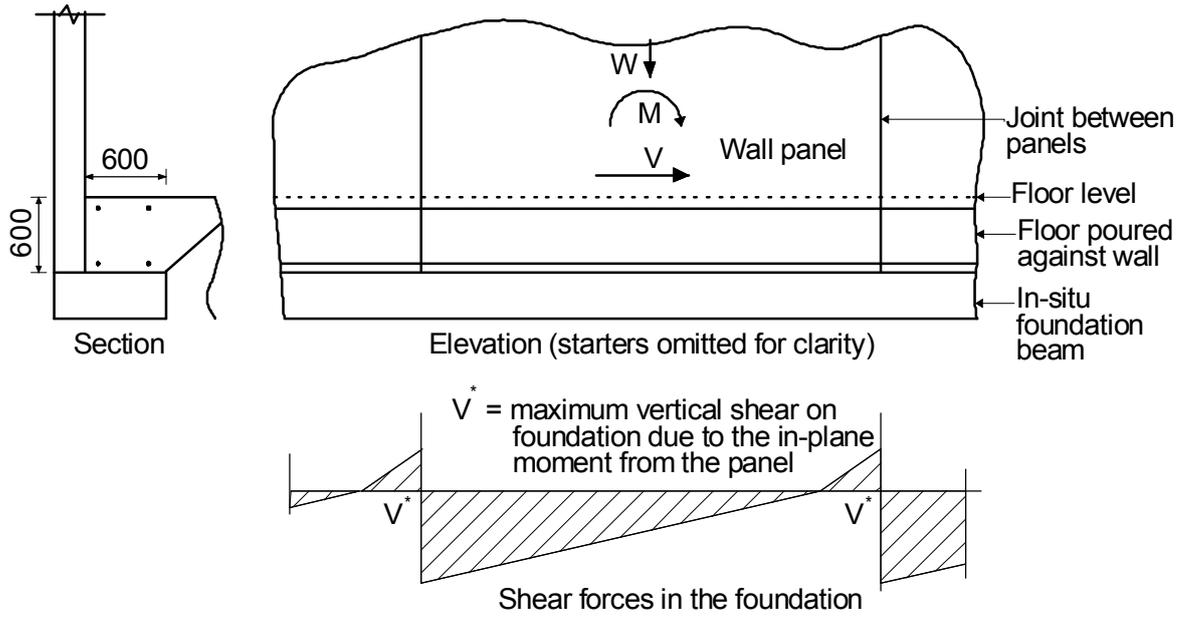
Vertical shear forces in foundation from the in-plane loaded panels
